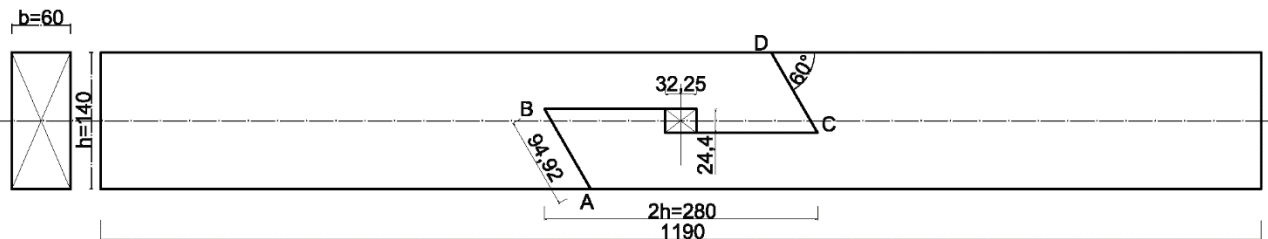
SPECIMEN 5 - Halved undersquinted and tabled scarf with key joint. All the dimensions are in [mm].
